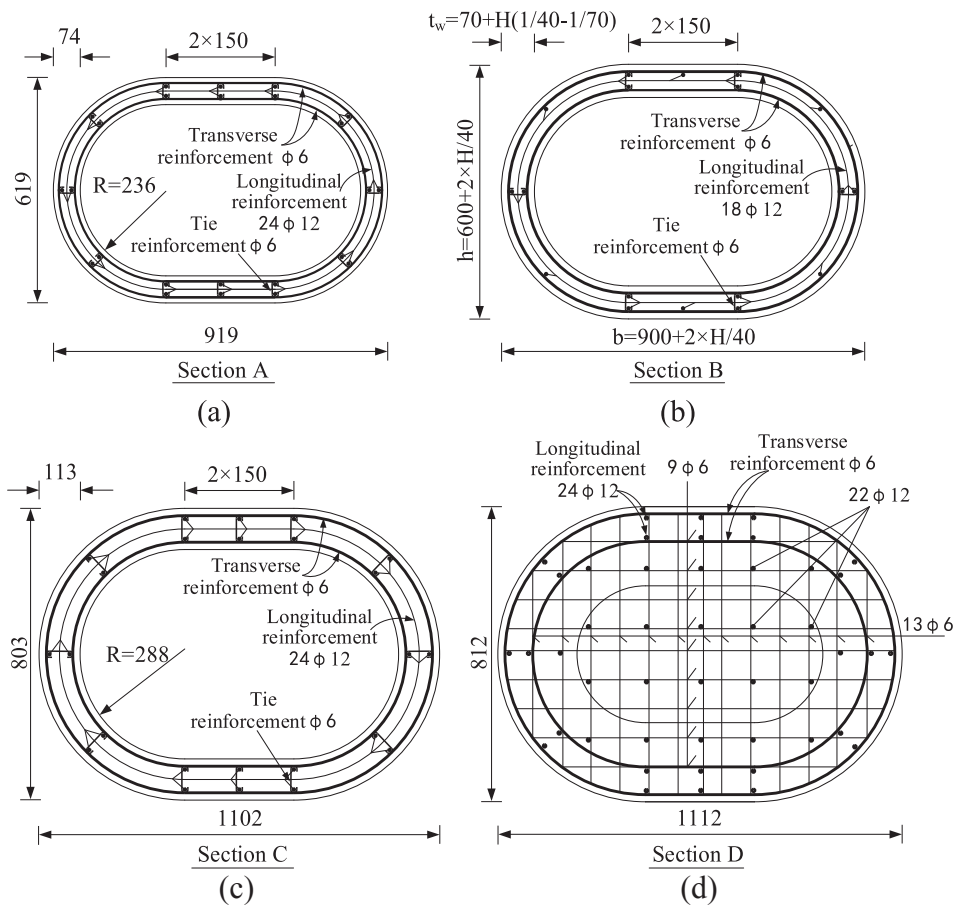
Geometry and rebar arrangement of Section A (a), Section B (b), Section C (c), and Section D (d) (unit: mm).
